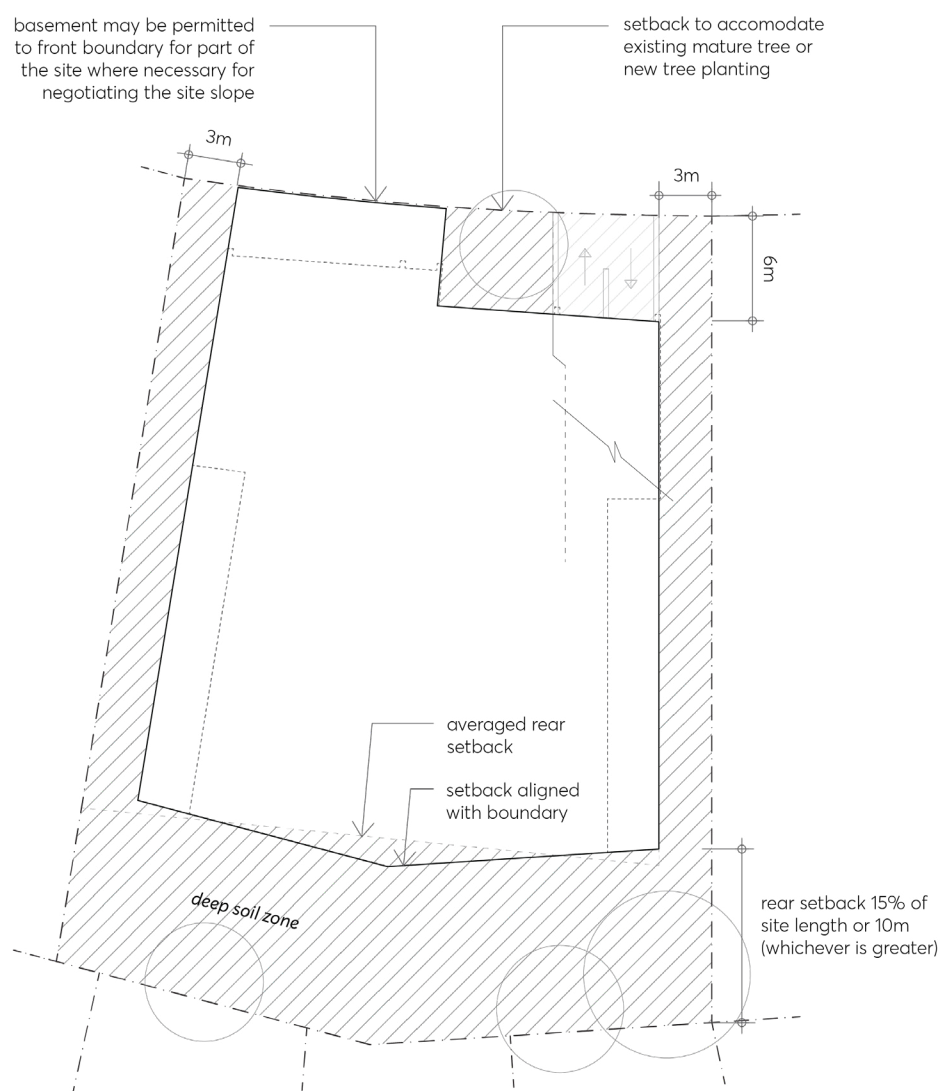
Indicative Basement and Deep Soil Plan
